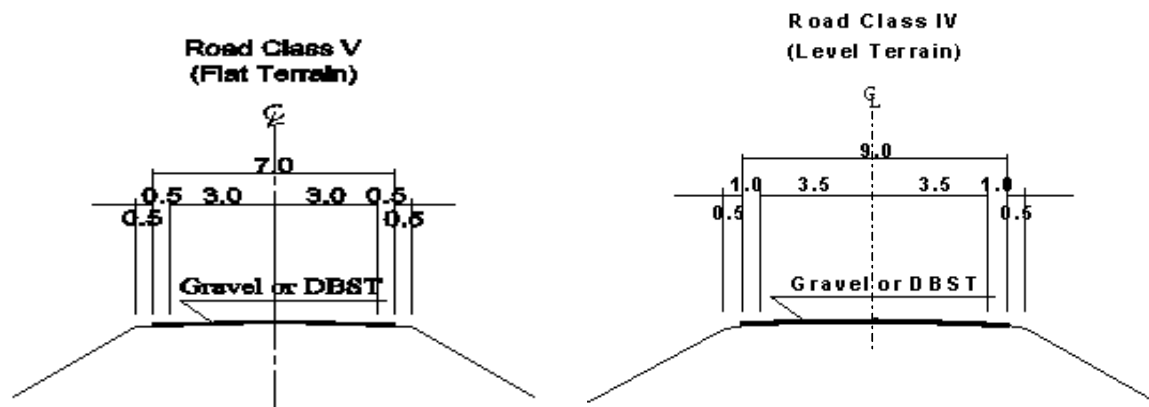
Typical Cross-Section of Rt. 18A
